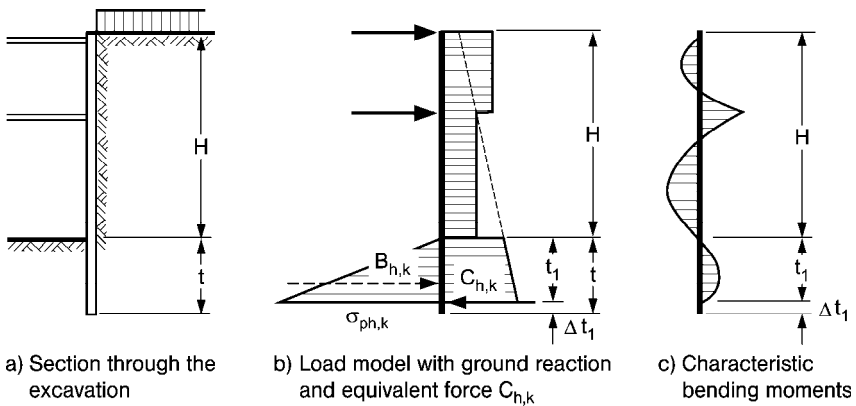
System, load and moment distribution for a double-propped sheet pile wall fixed in the ground
